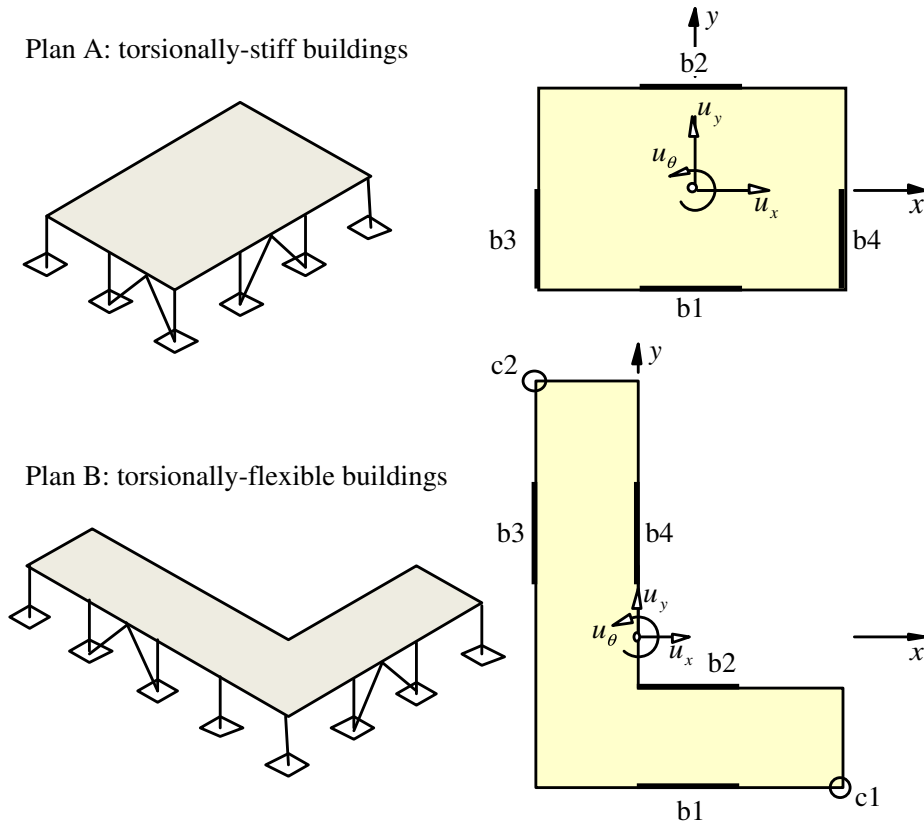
Schematic isometric and plan views of the selected single-story structural systems with three-degrees-of-freedom noted; BRBs are highlighted as b1...4.
